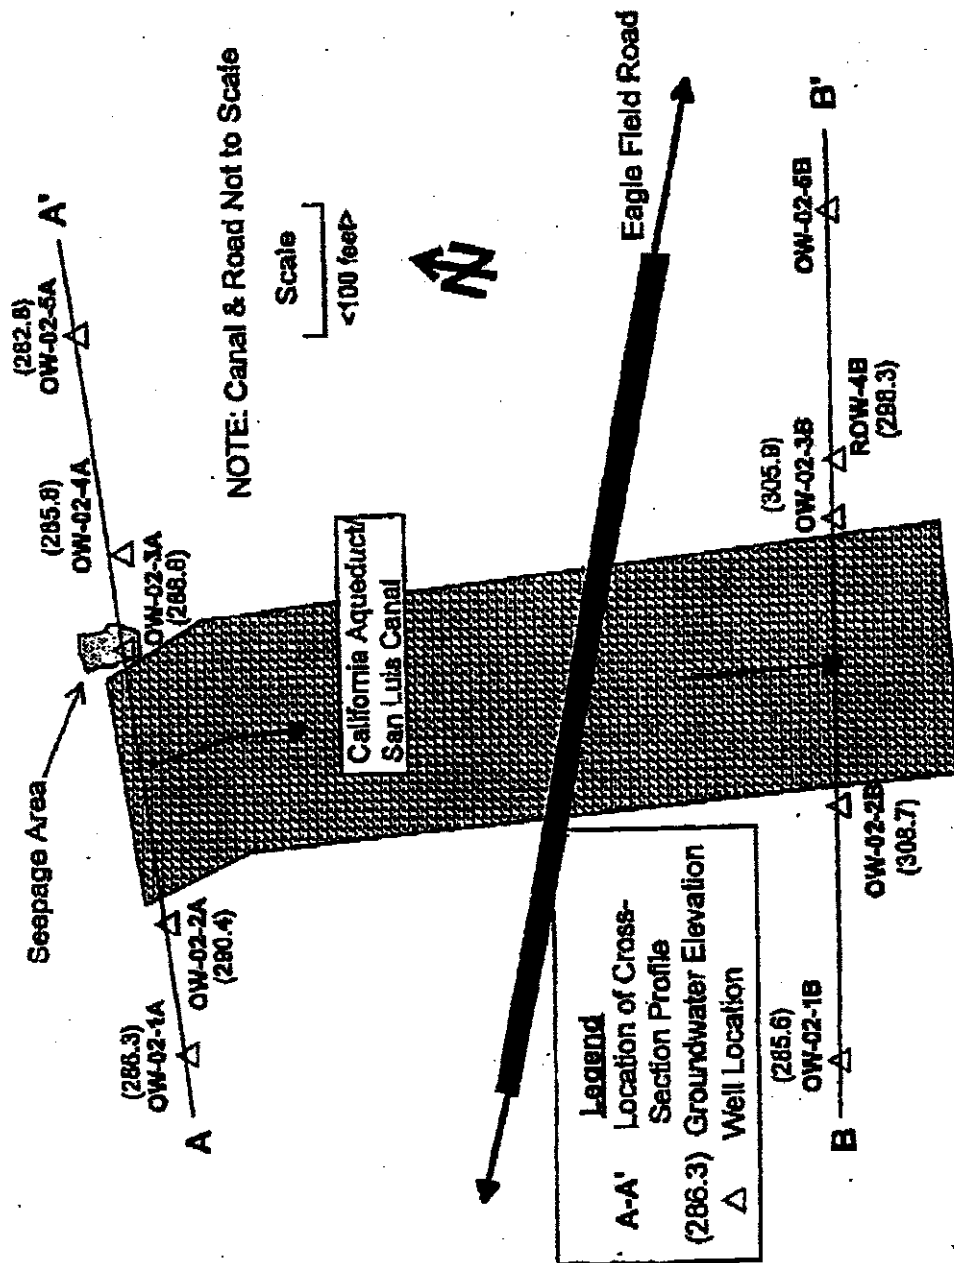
Eagle Field Road - Location of Wells and Groundwater Elevations
